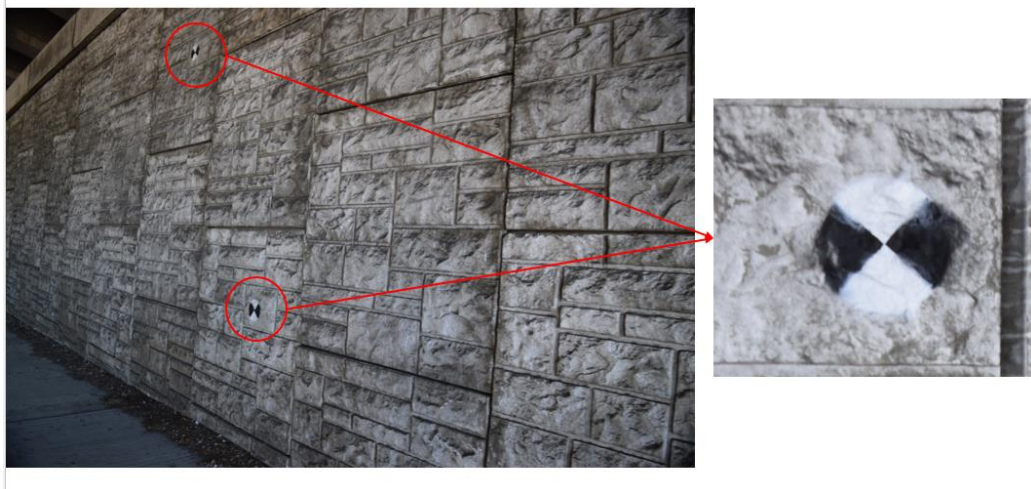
Photo. Painted CPs on MSE wall at B4 – King George
